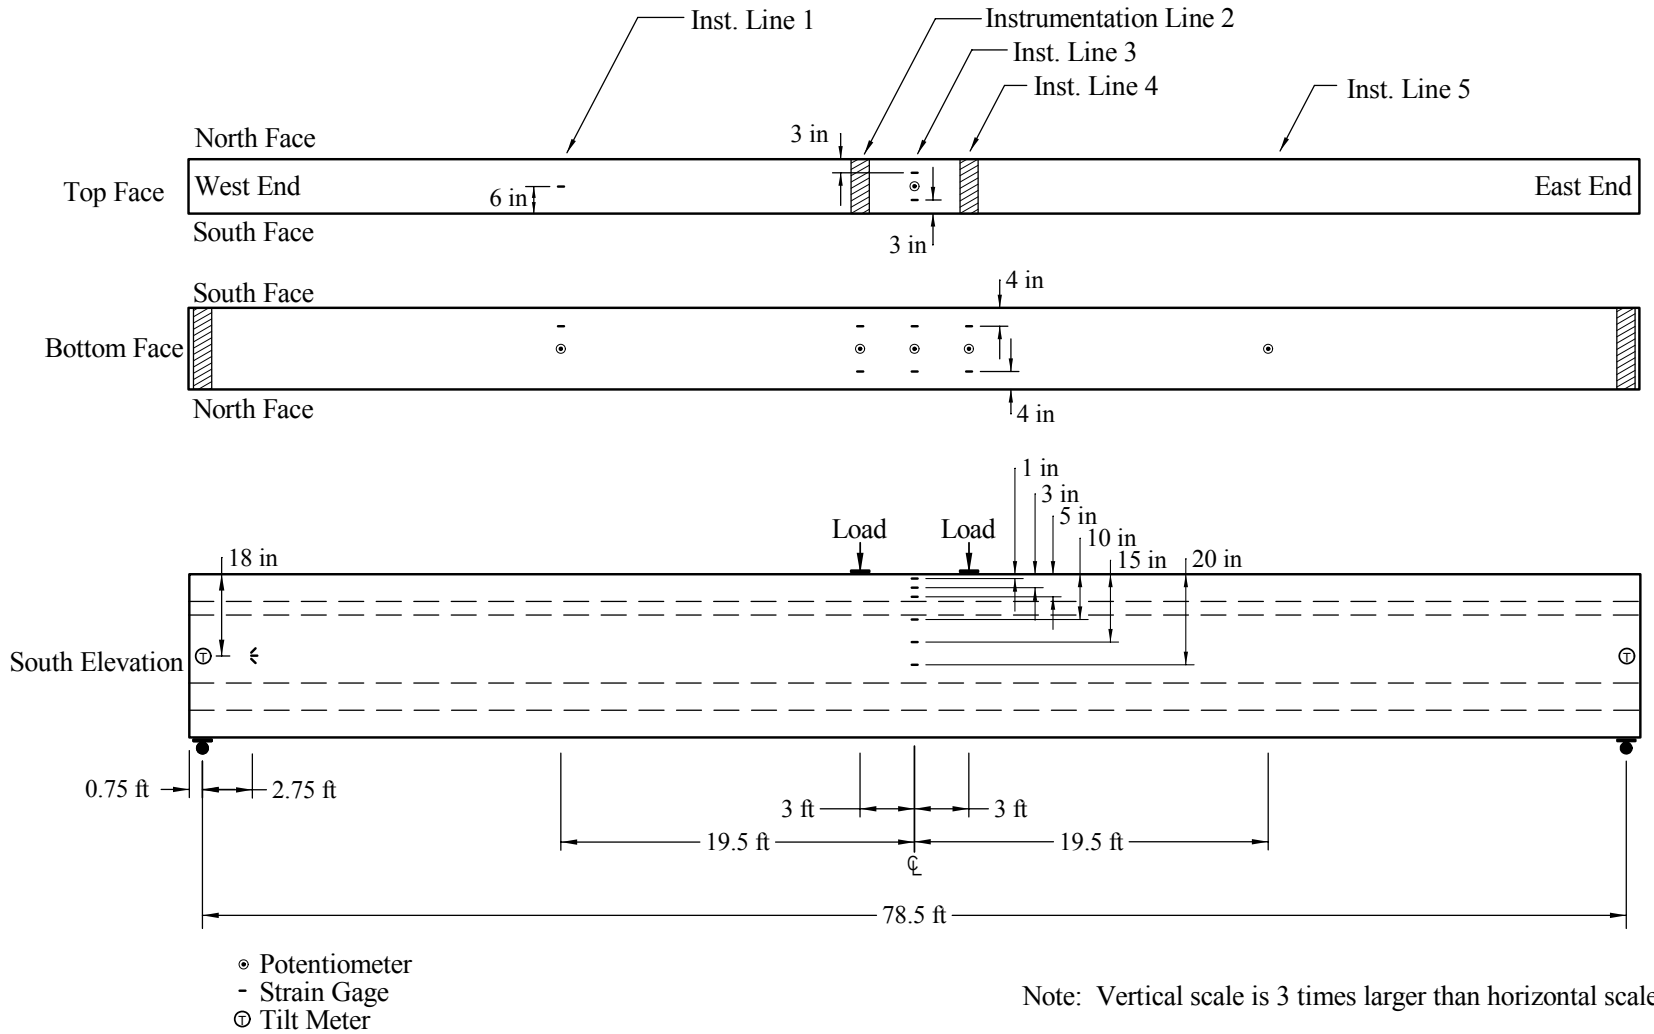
A: Instrumentation plan for Girder 80F
